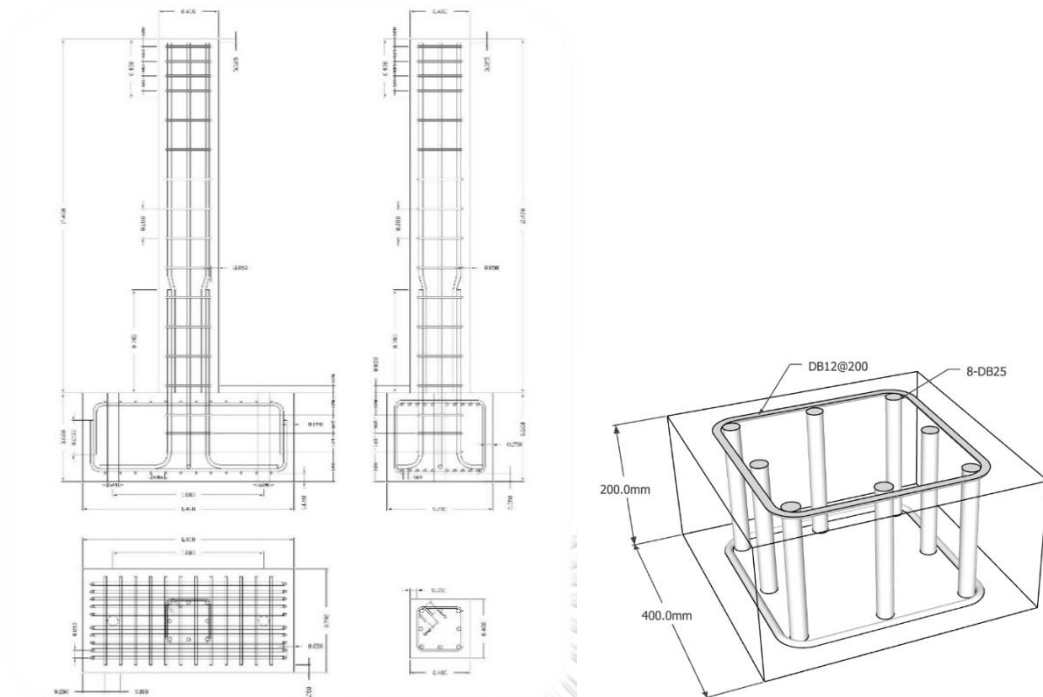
Reinforcement detailing of lap splice column specimen LS
